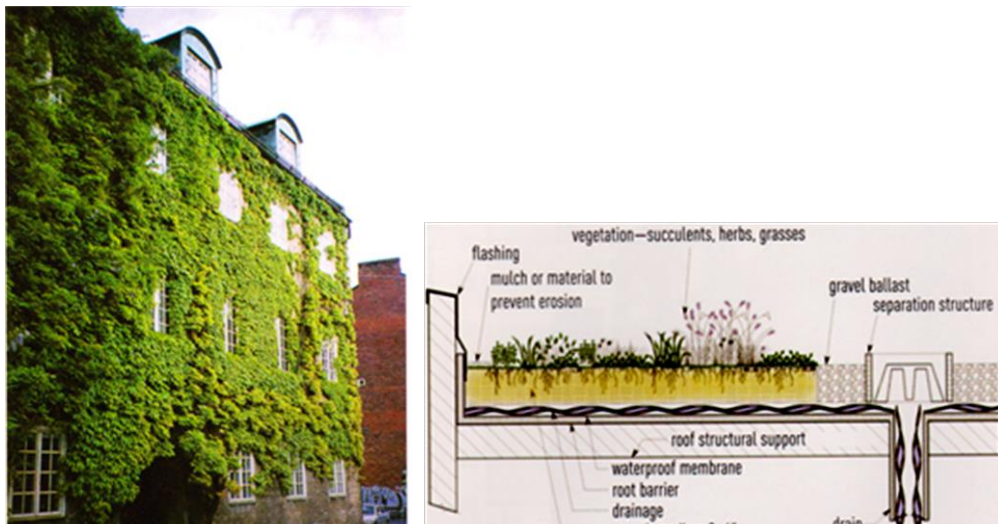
The green wall provides effective cooling (left); Green roof cross section, (right).
